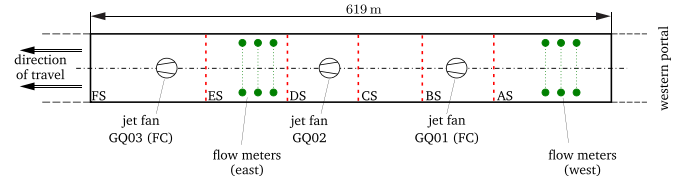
Schematic layout and installation scheme of the southern tube of motorway tunnel St. Ruprecht on Semmering motorway S6.
